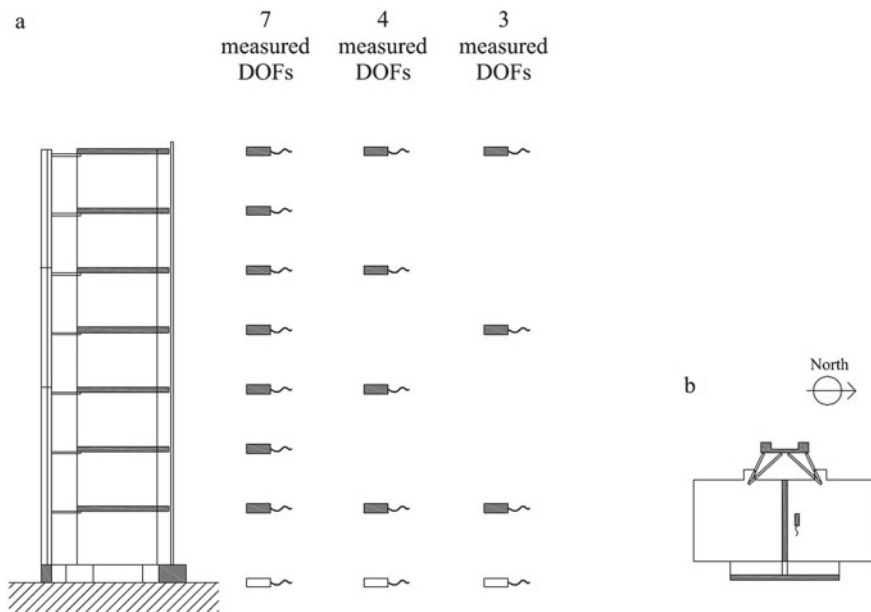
Schematic drawing of the geometry of the structure with indications of the measured DOFs (geometry retrieved from [23, 24]): a elevation—south face; b floor plan view
